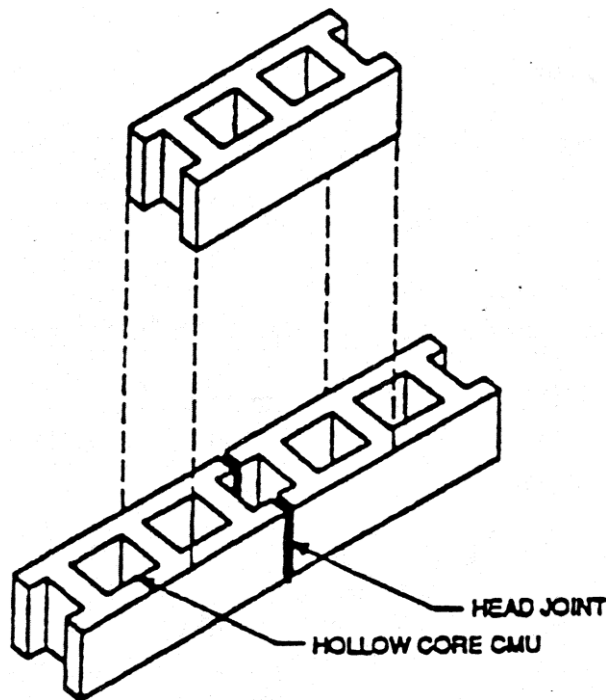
Concrete Masonry Unit Detail - CMU, Source: RF Simon Co. Inc.
